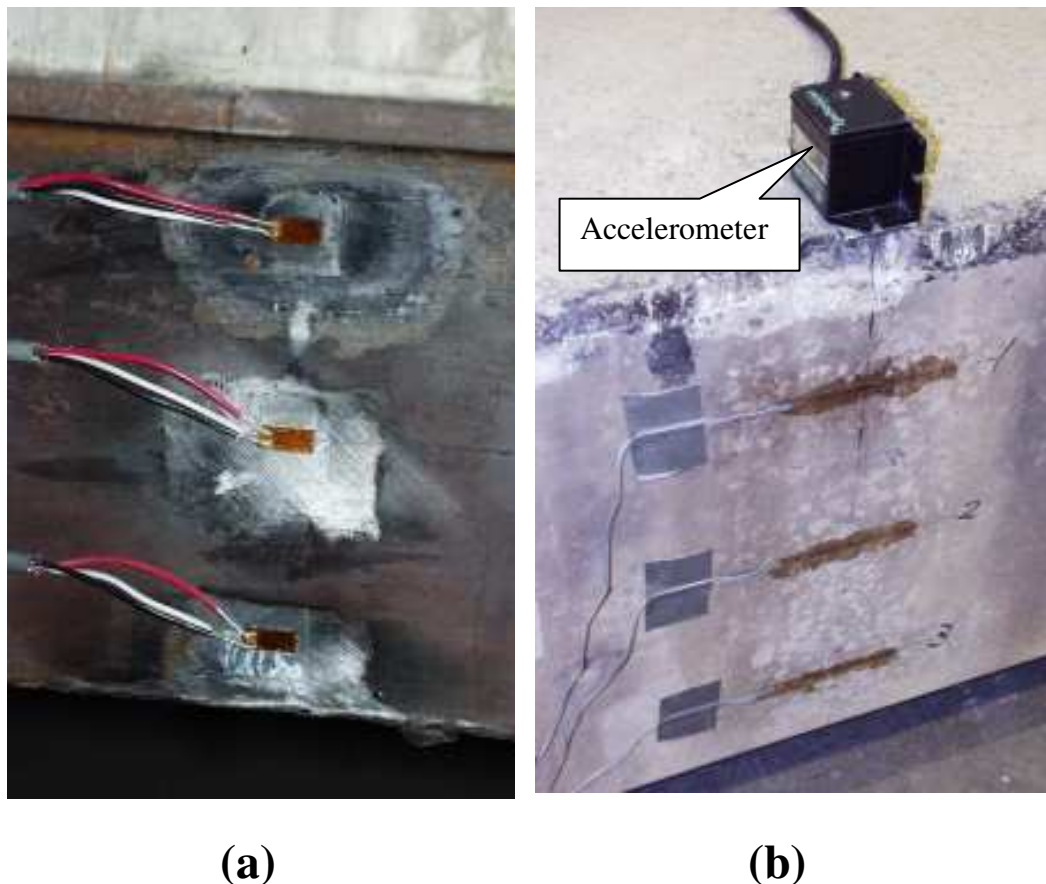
Installation of sensors: (a) strain gauges bonded on the girder web of the steel-free bridge deck; (b) strain gauges bonded on the vertical side and the accelerometer mounted on the top surface of the prestressed concrete girder.
